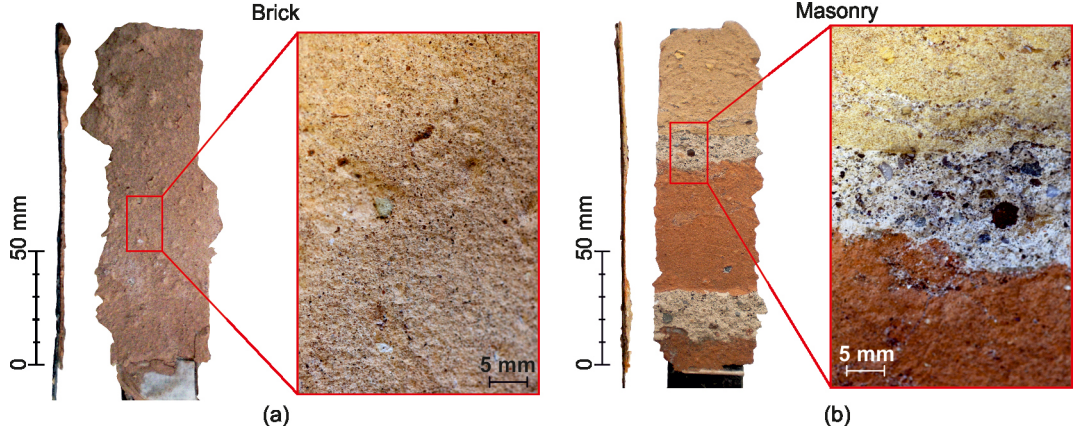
Type-2 failure observed for specimens built up with C-series bricks: (a) brick specimen C-2; (b) masonry specimen MC-2.
